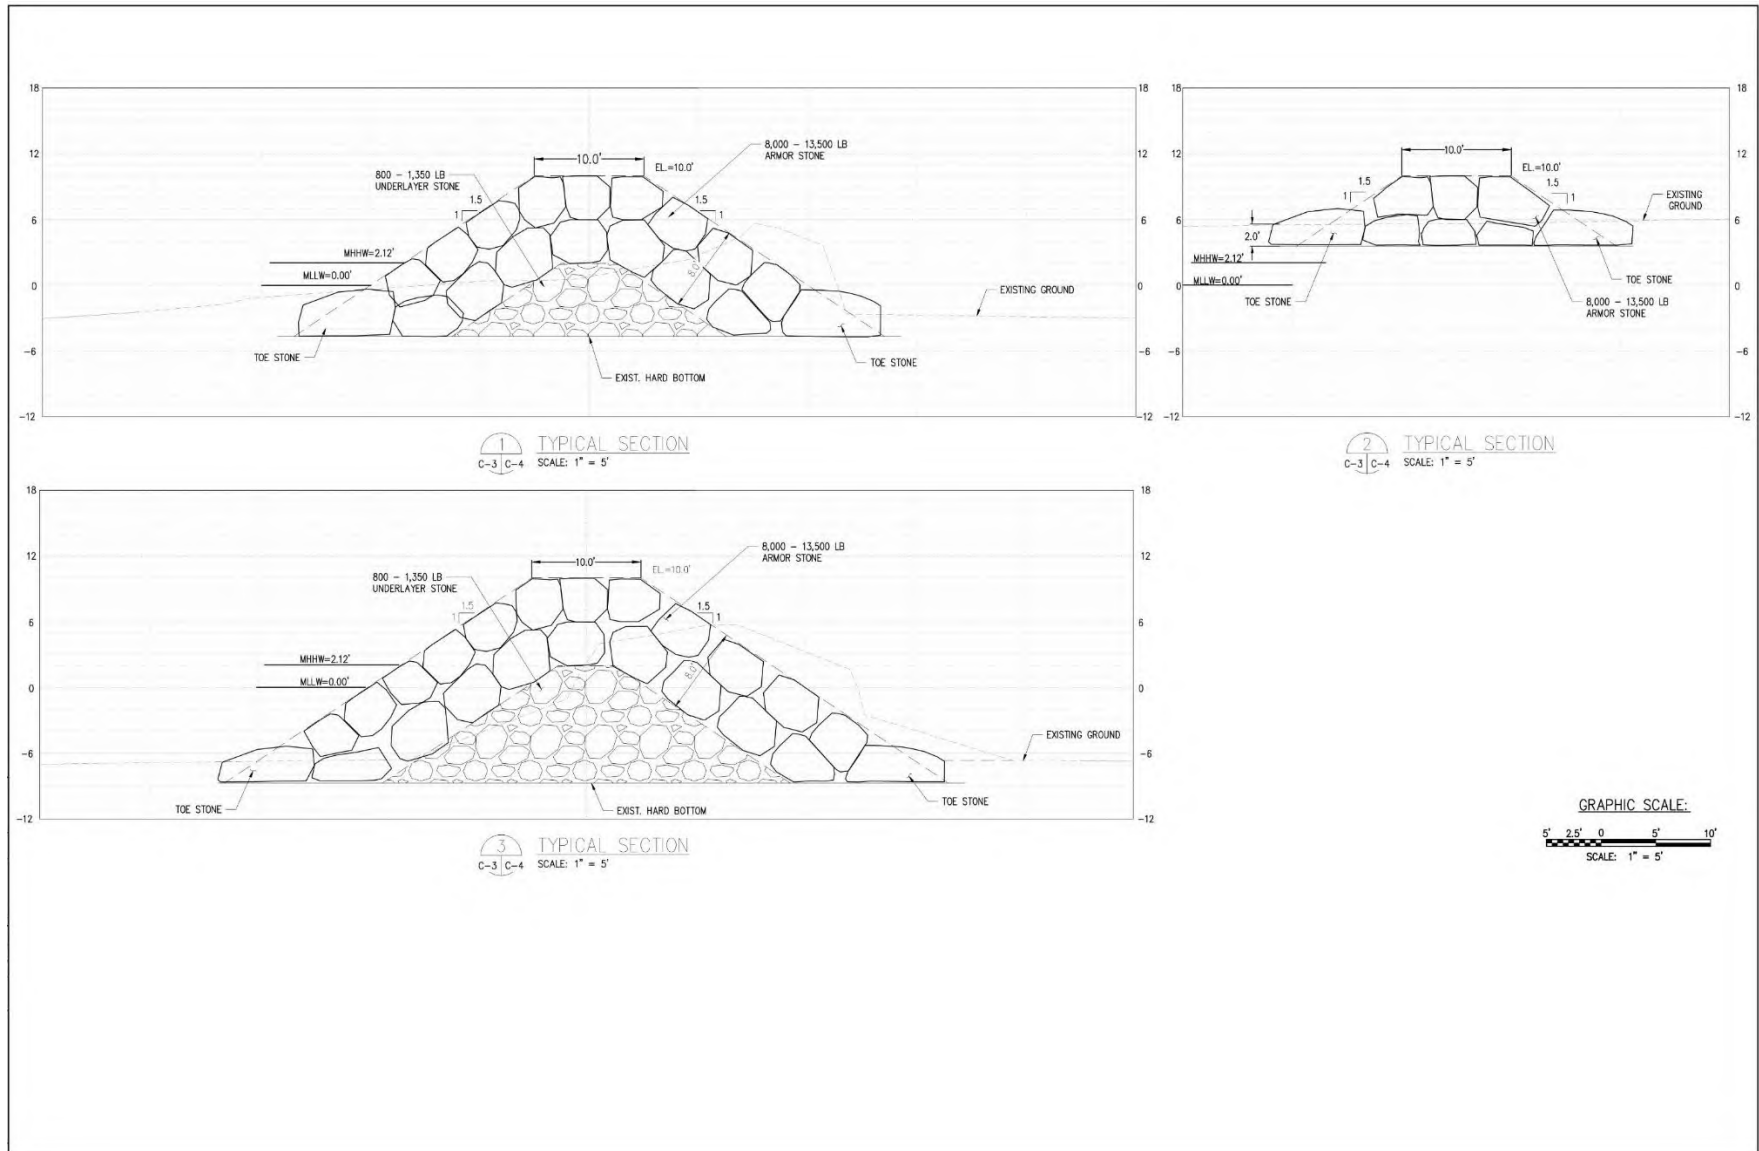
Typical Cross Section Details for Modified Breakwater in Proposed Action
